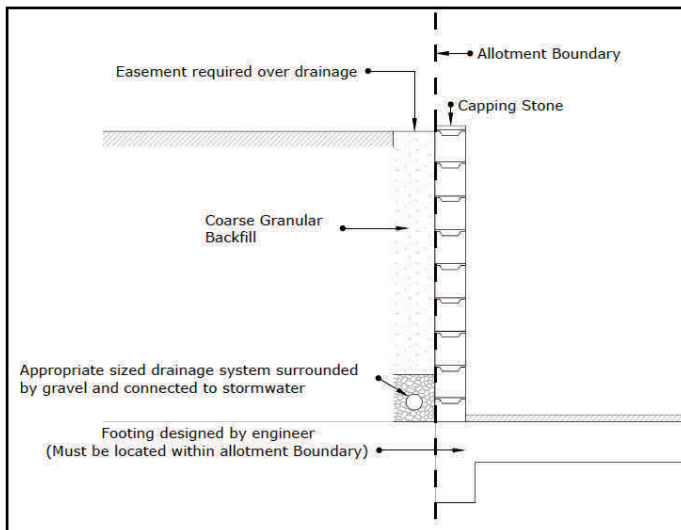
Indicative diagram showing retaining wall on one allotment and an easement required for drainage on the other allotment.
